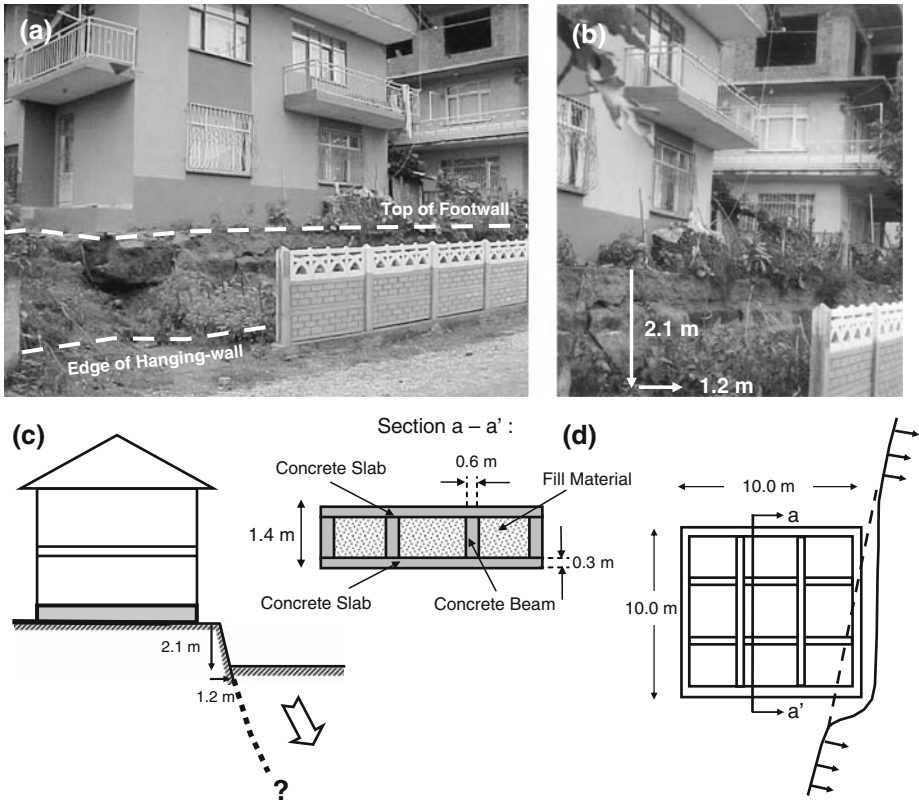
Building 3, two stories plus attic; Minor Damage: (a) photo of the building, showing the fault scarp right next to the building (adapted from Youd et al. 2000), (b) photo of the rupture scarp in front of the building, showing the measured vertical and horizontal displacement, (c) schematic cross-section of the building, and (d) plan view of its box-type foundation along with a representation of the diverted rupture.
